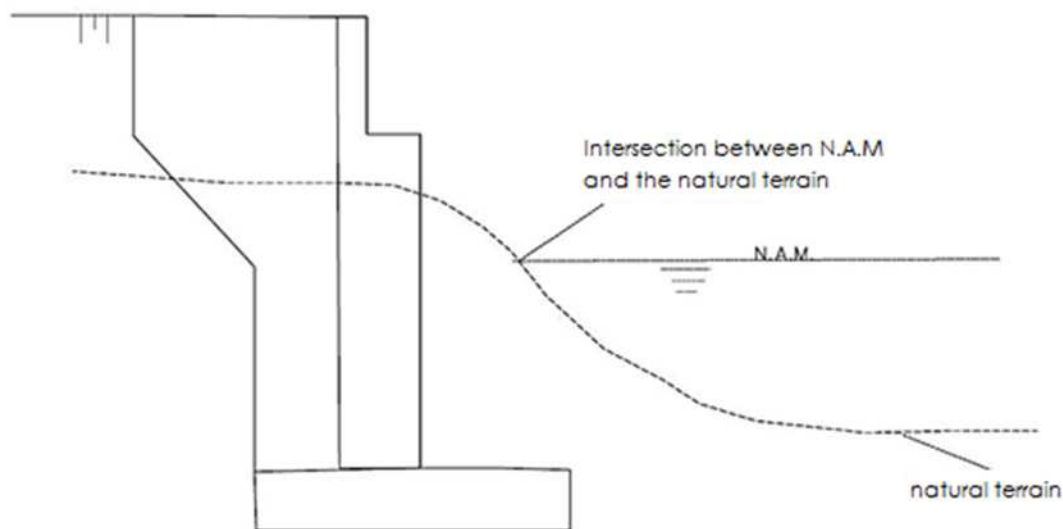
Location of bridge abutments relative to the riverbanks and road batters
